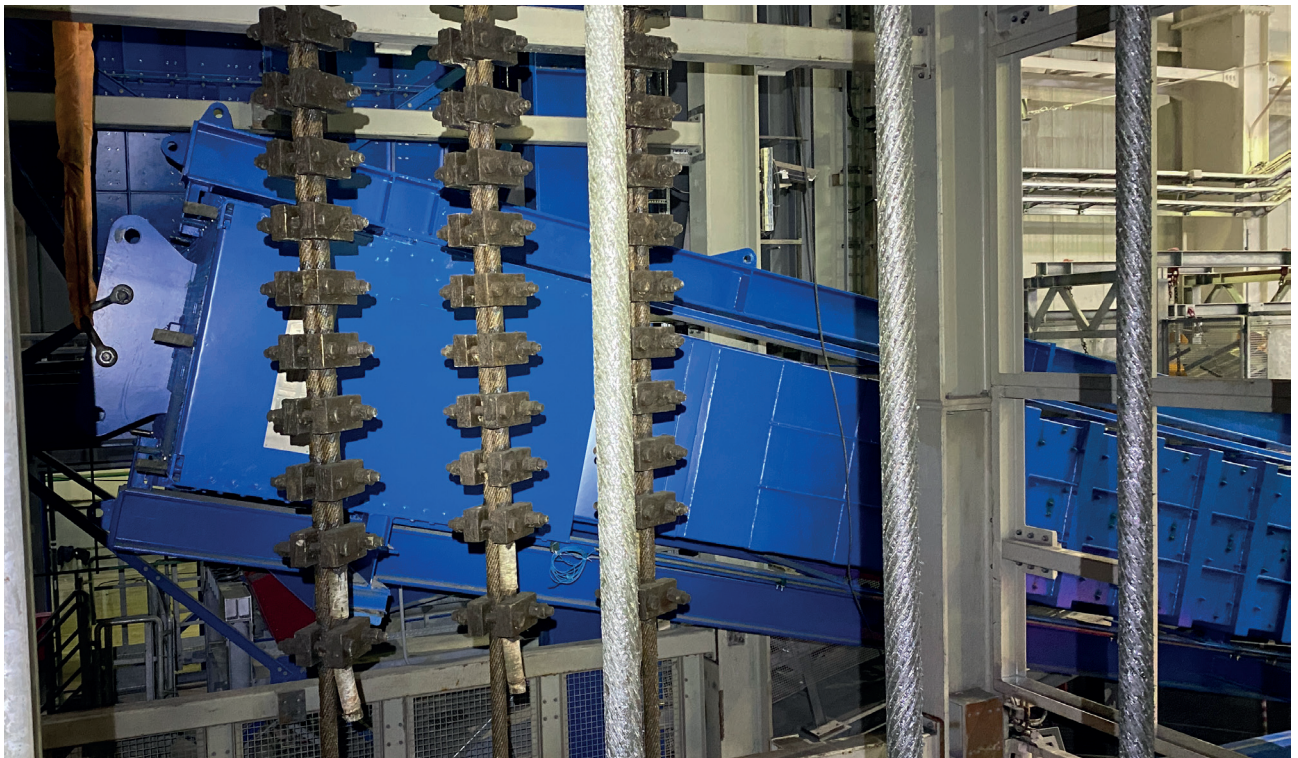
Lifting and pulling the skip into the head frame is done with the hoisting machine.
